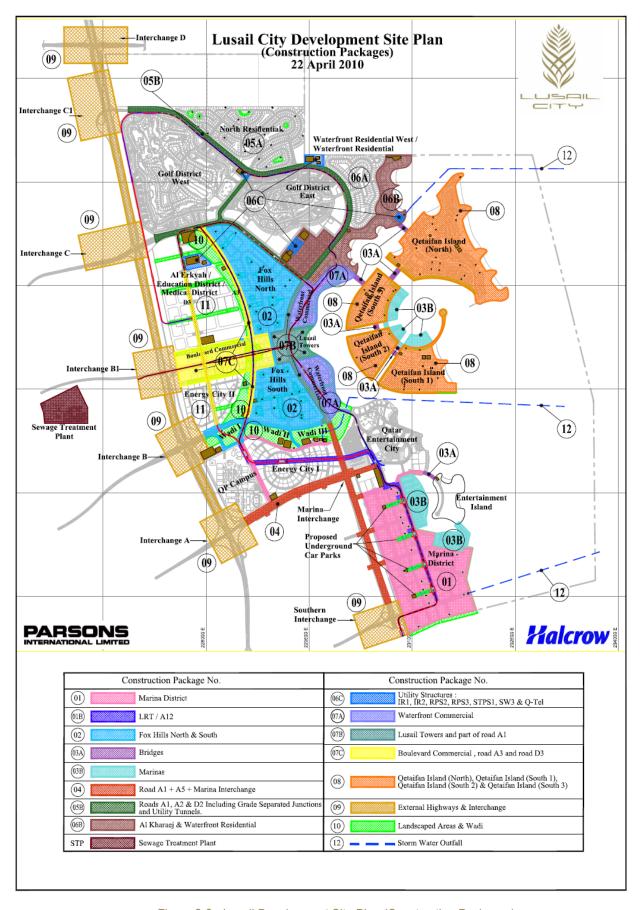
Lusail Development Site Plan (Construction Packages)
